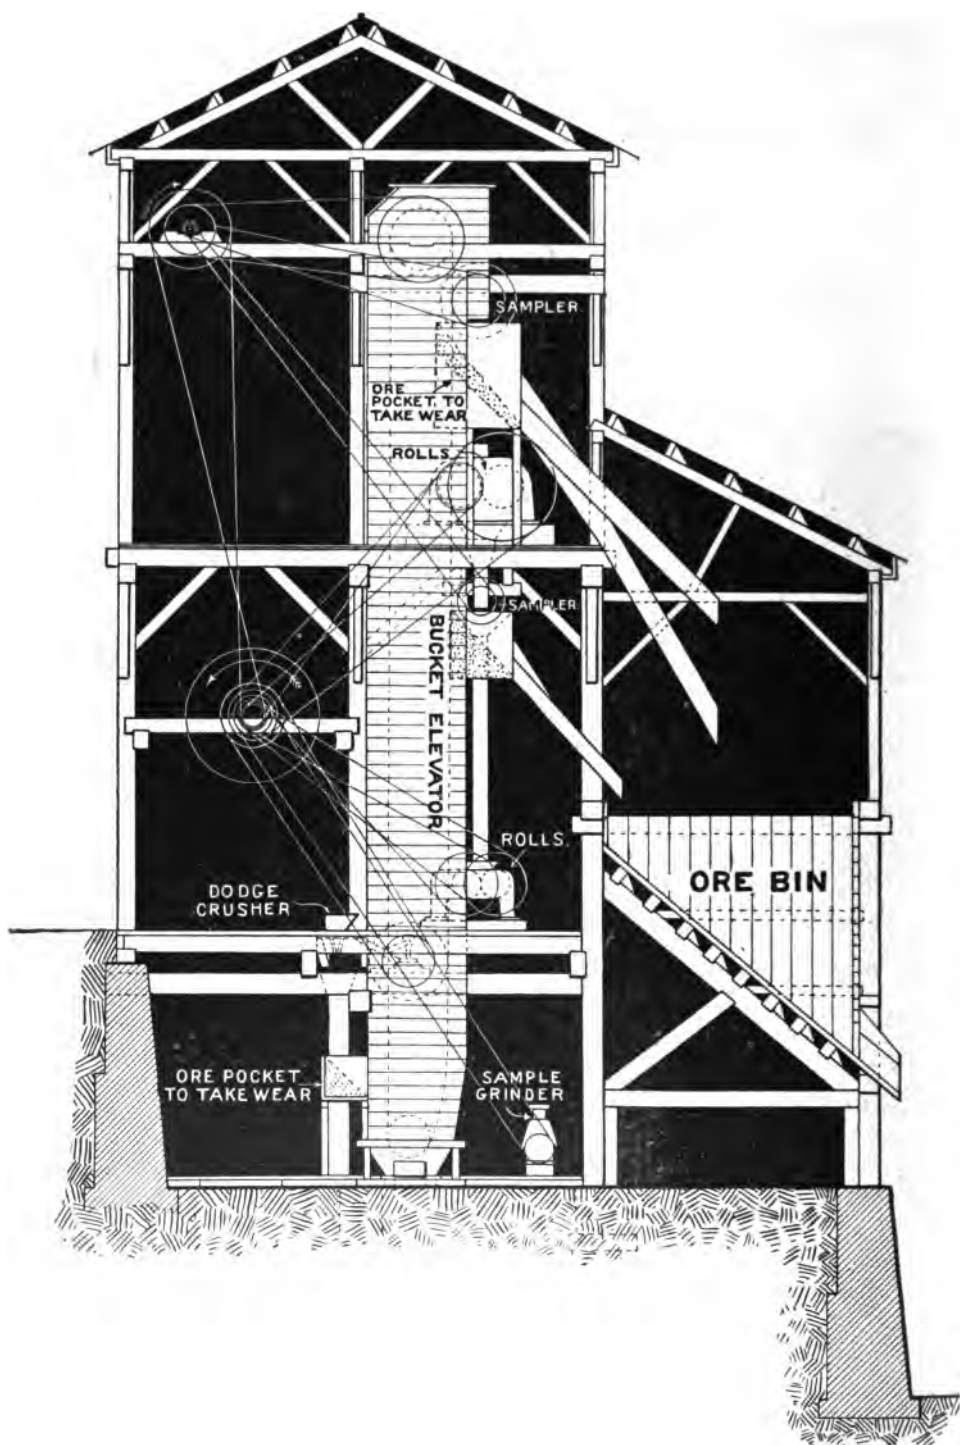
AUTOMATIC SAMPLING PLANT. (SIDE ELEVATION.)
